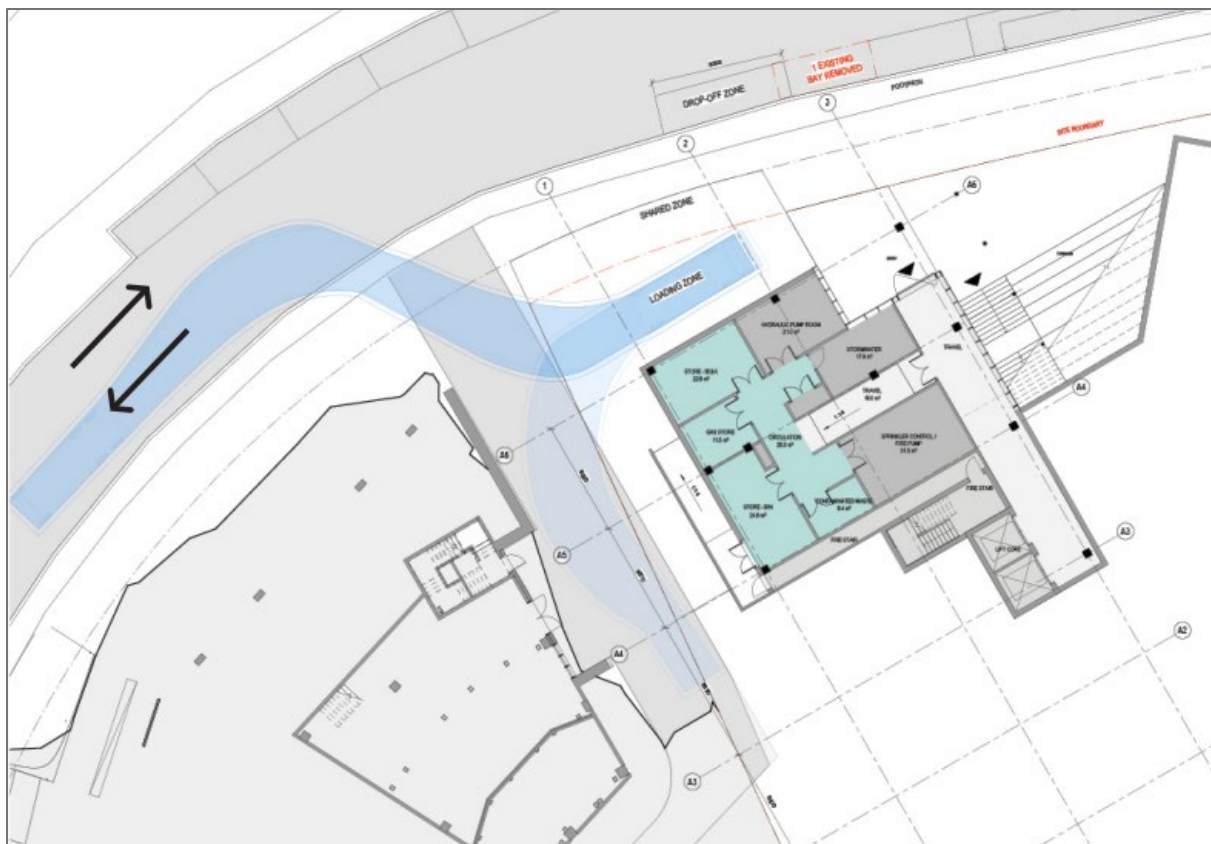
Loading zone access for the proposed Lang Walker AO Medical Research Building – Macarthur. Source: BVN.
